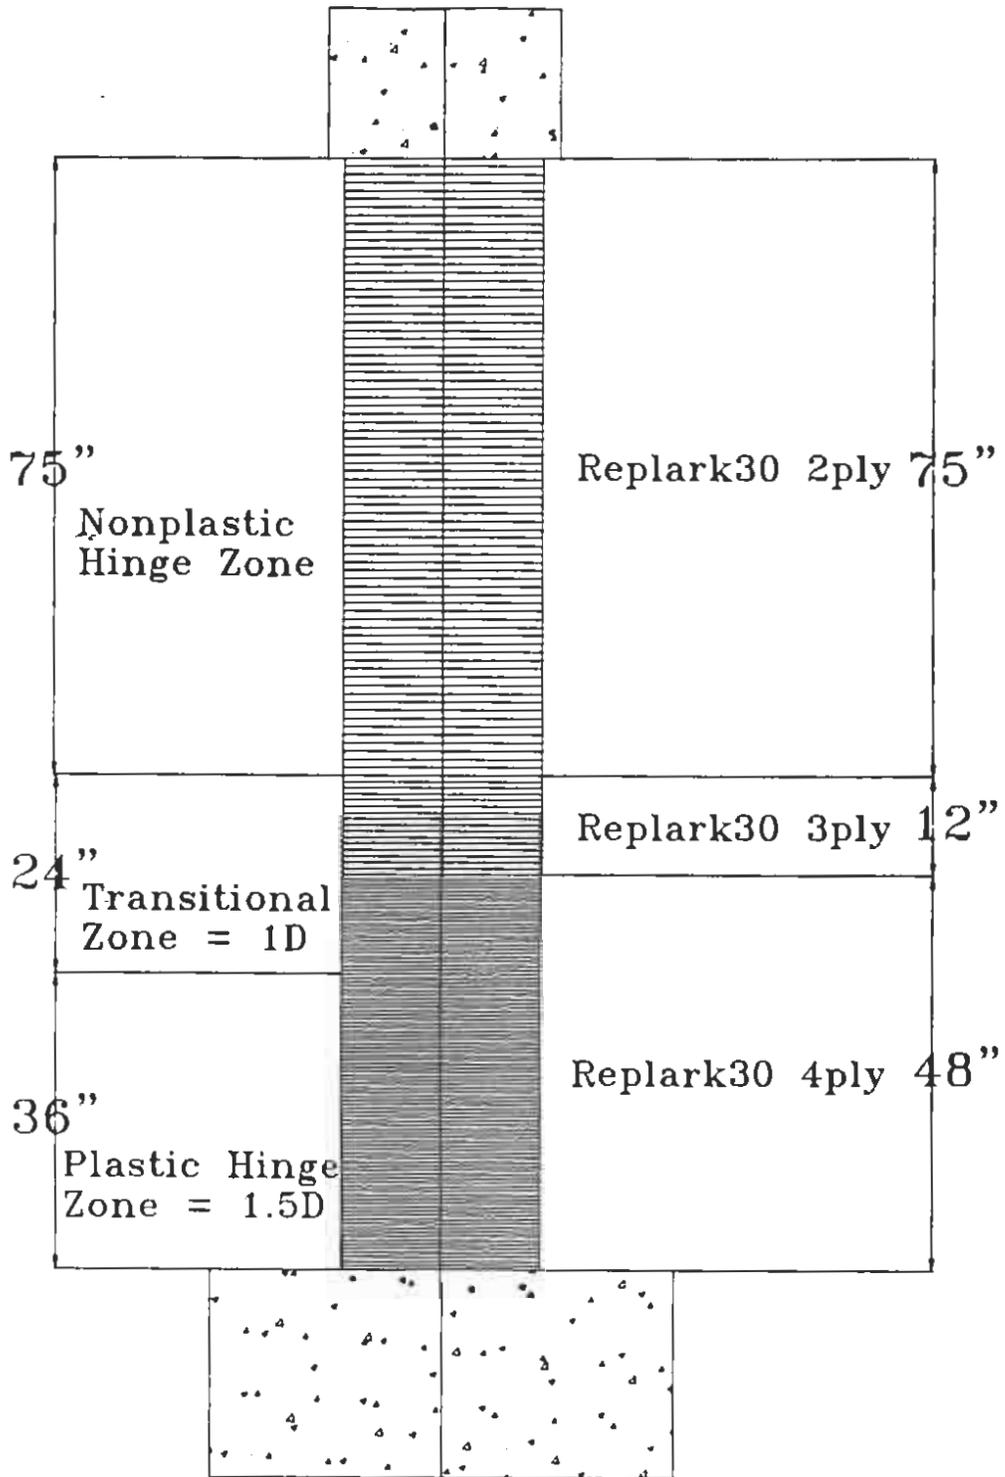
Composite Jacket for Lap Splice Enhancement Circular Column CF-4
